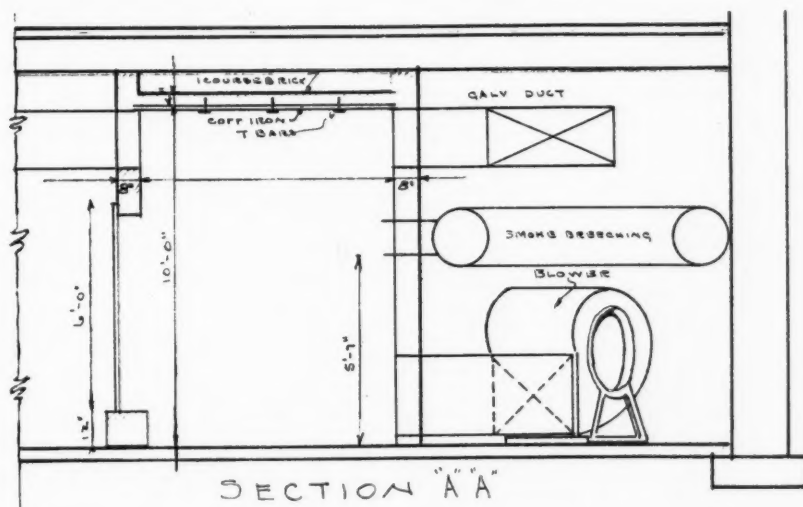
Cross section through furnace-fan room showing construction of the corrugated iron on Tee bar roof with brick course above for insulation.
